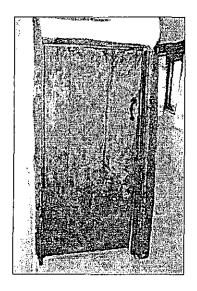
Room 14, bedroom. Eighteenth century timber board door
